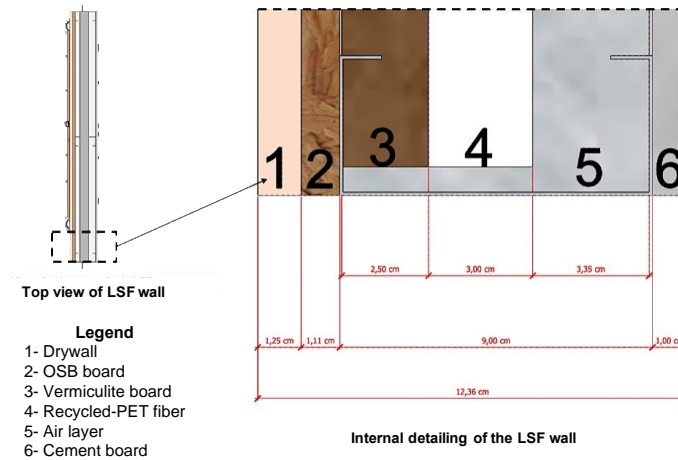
Internal detailing of the test wall (view from above).Source: Prepared by the authors, 2024.
